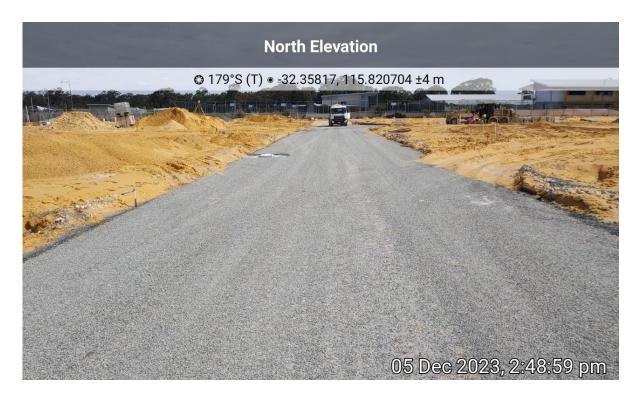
Evidence of construction of internal roads is underway in accordance with Roadworks Layout Plan.
